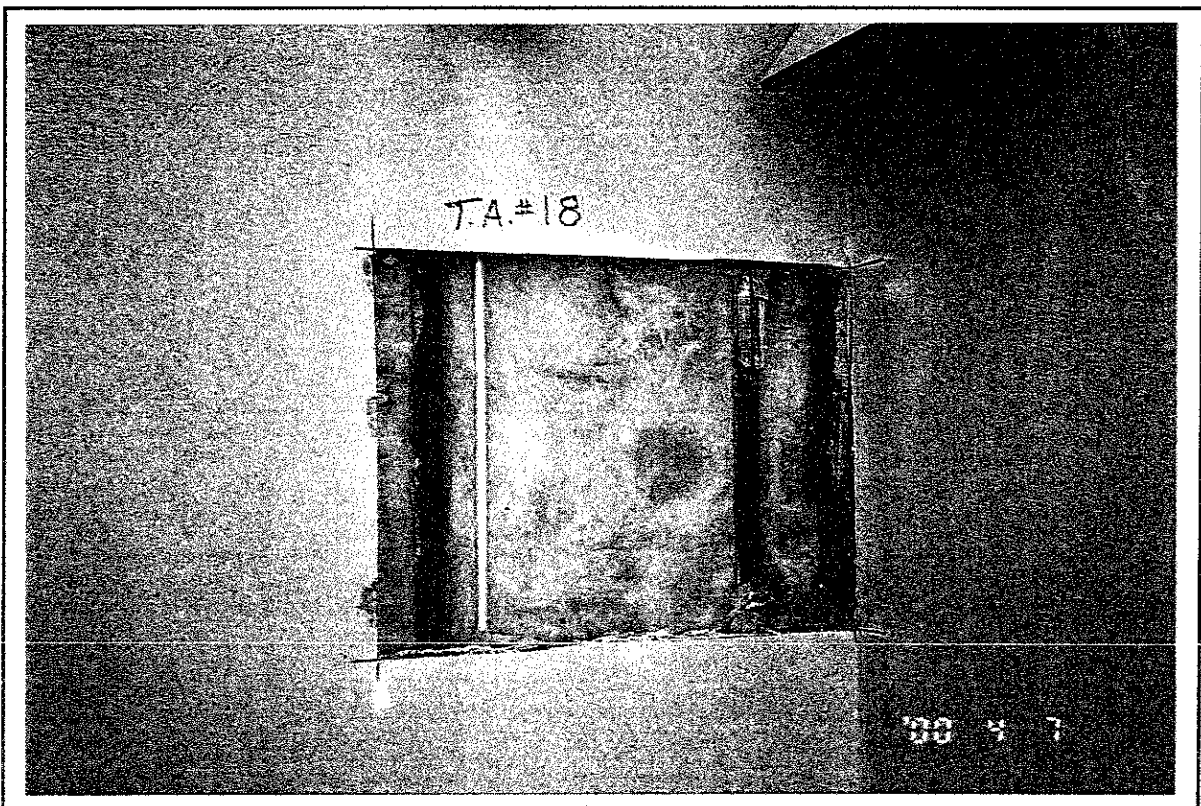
Test Area #18 – Corroded steel studs to North of East roof access door
